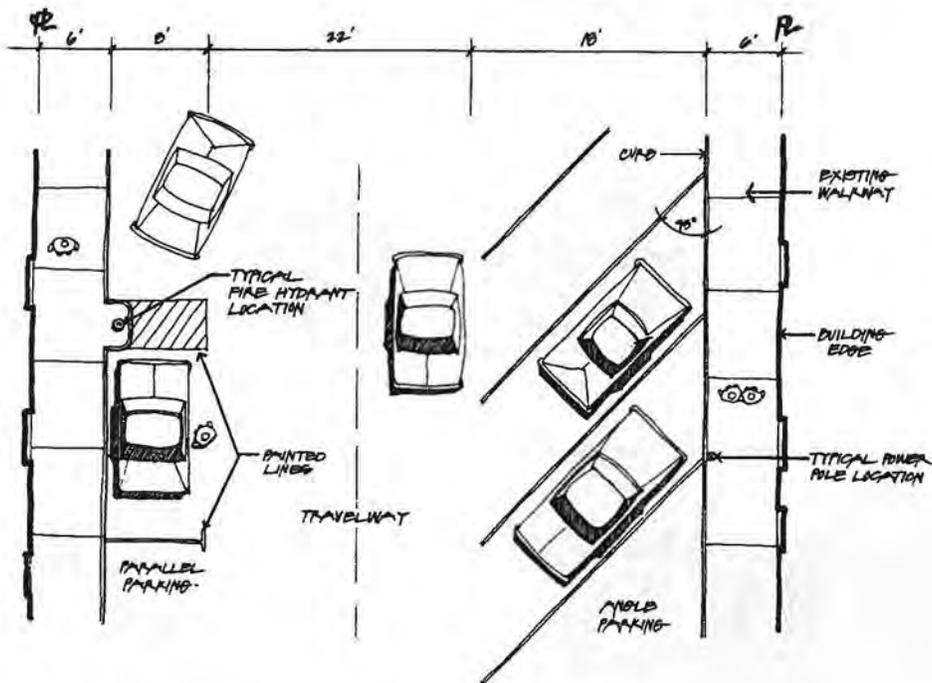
PROPOSED BALDWIN AVE.—PLAN
